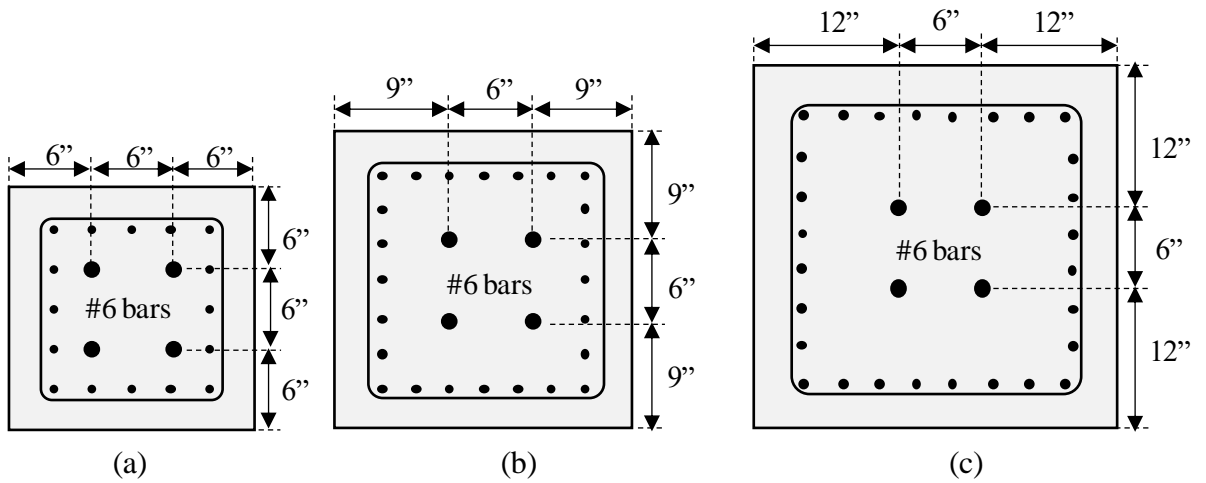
Location of interface steel layout in (a) 18-inch, (b) 24-inch, and (c) 30-inch square prestressed piles
